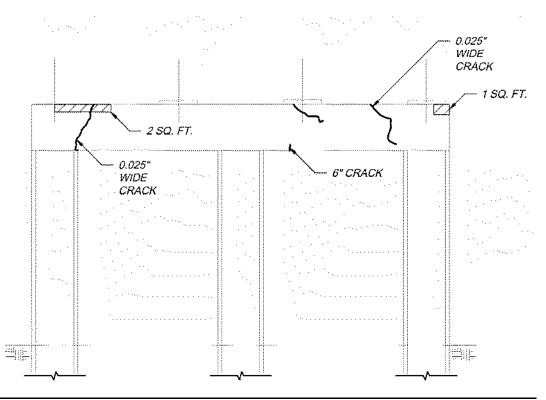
Location of Proposed Concrete Repairs - Pier 3 Upstation (South) Face Elevation MP 182.1
